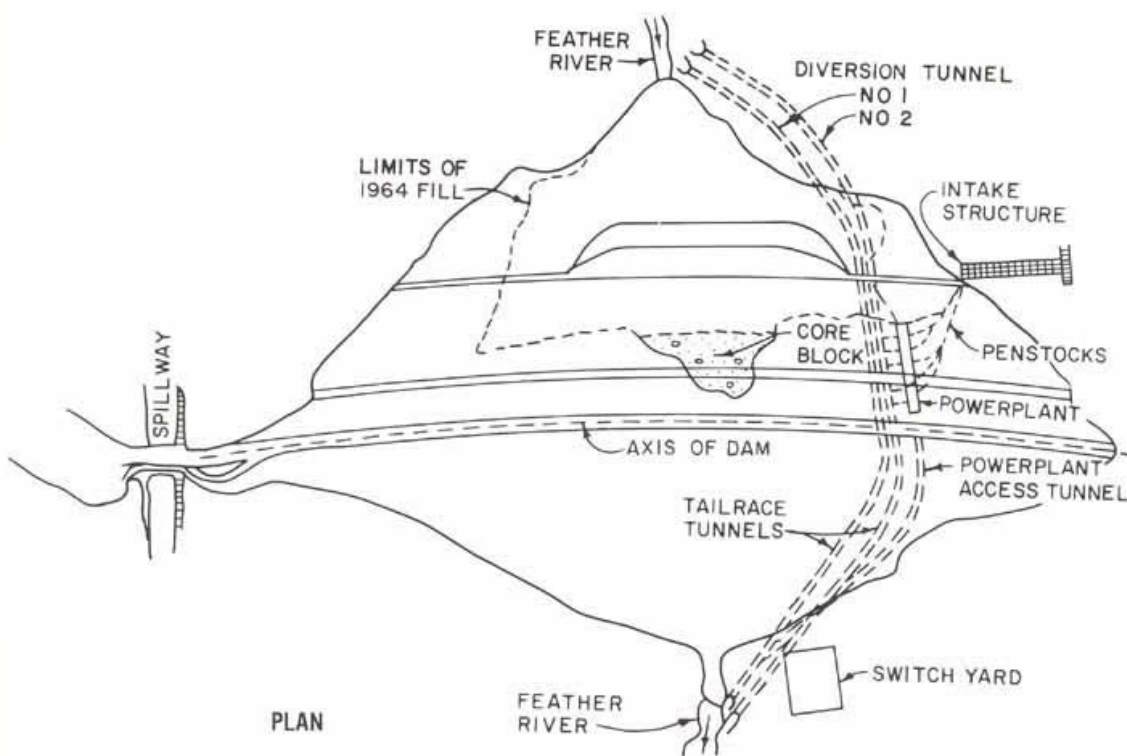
Oroville Dam, plan and cross section (1 of 2). P-801-D-79335.
